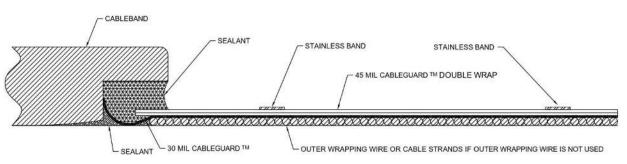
CABLE BAND FINISH WITHOUT CABLEGUARD™ WEDGE SEAL – SEALANT ONLY OPTION
